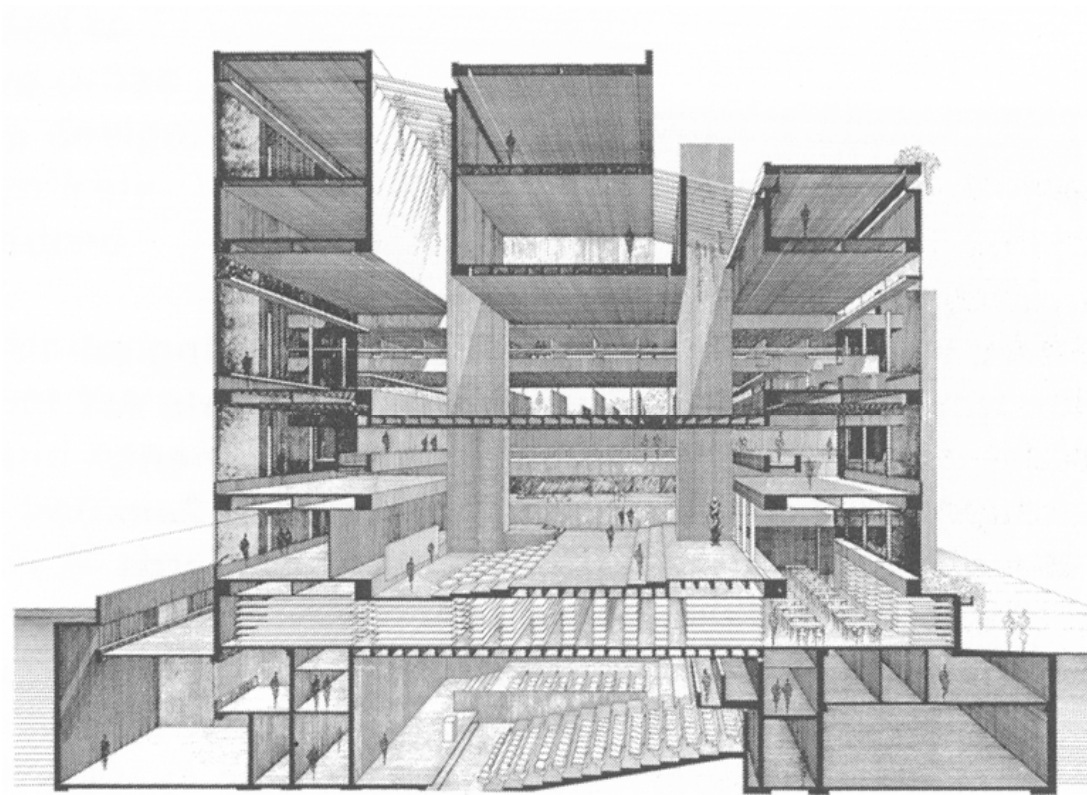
Yale Art and Architecture School. section. (Foster, p.41)
